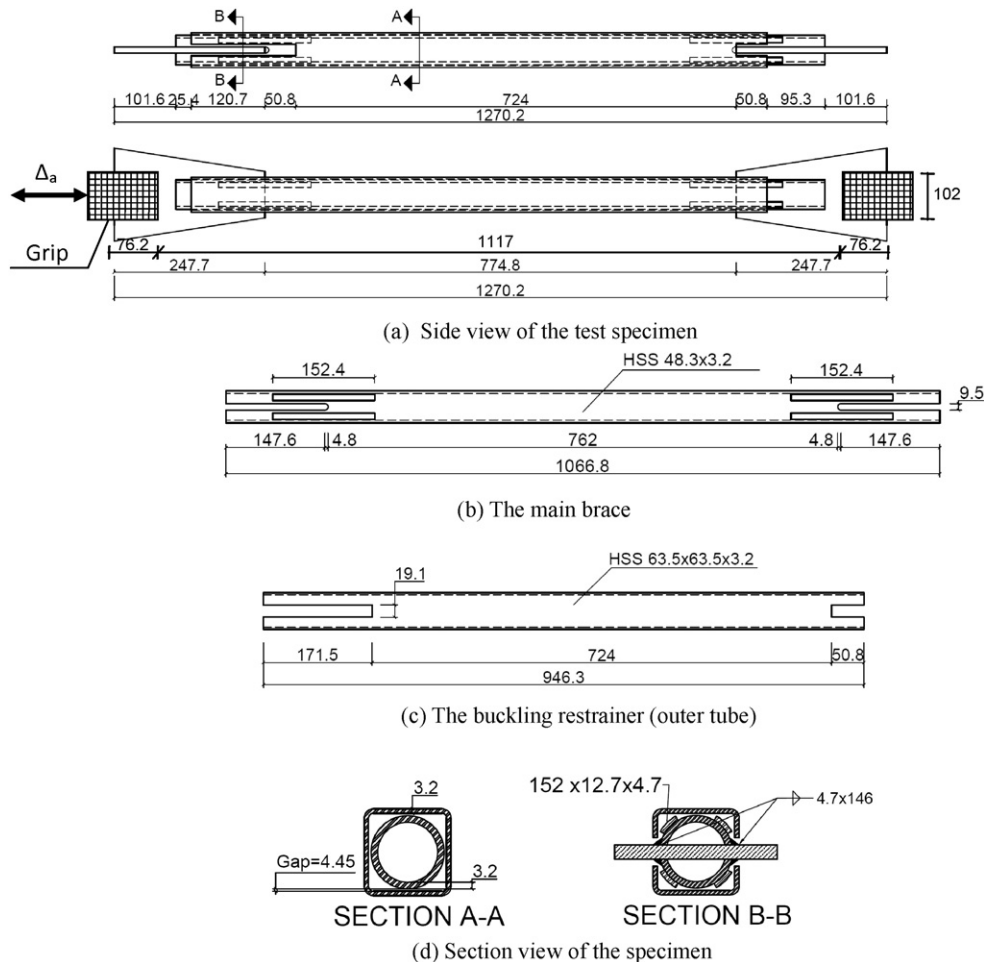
Drawings of the tested TBRB specimen (units: mm; not to scale).
